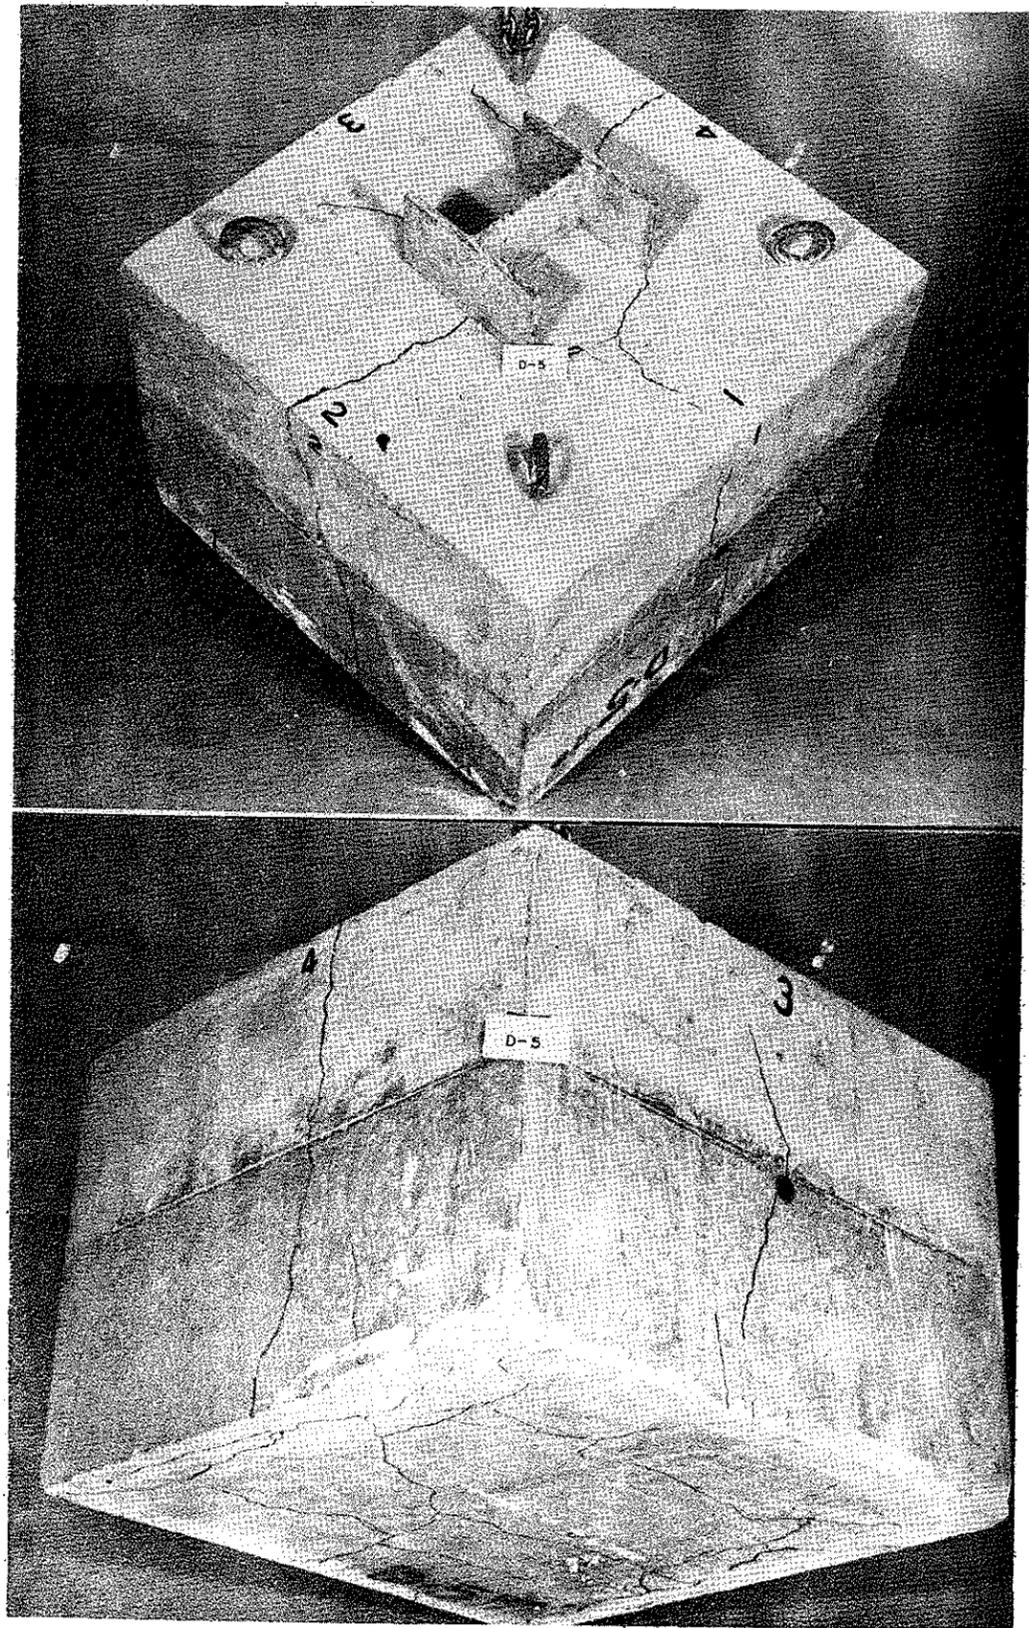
APPEARANCE OF SPECIMEN D-5 AFTER TESTING.
